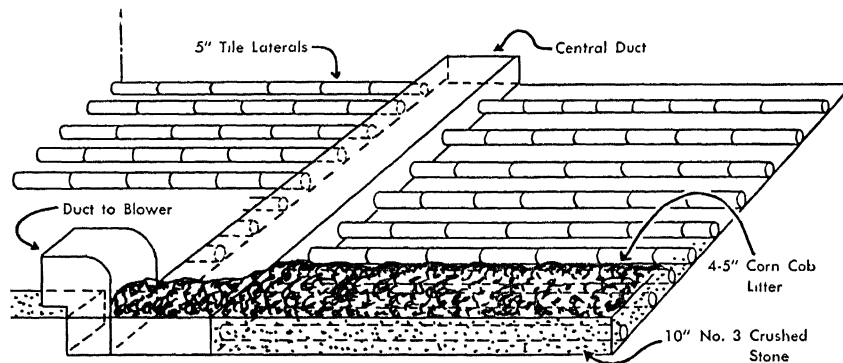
These are the air-collecting ducts used in pulling ventilating air through litter supported on crushed stone.
